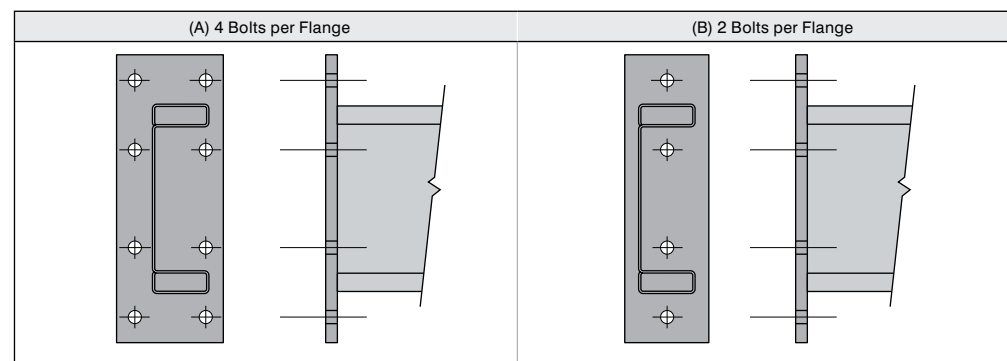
Typical Bolt Arrangement for Bolted Moment End Plate
